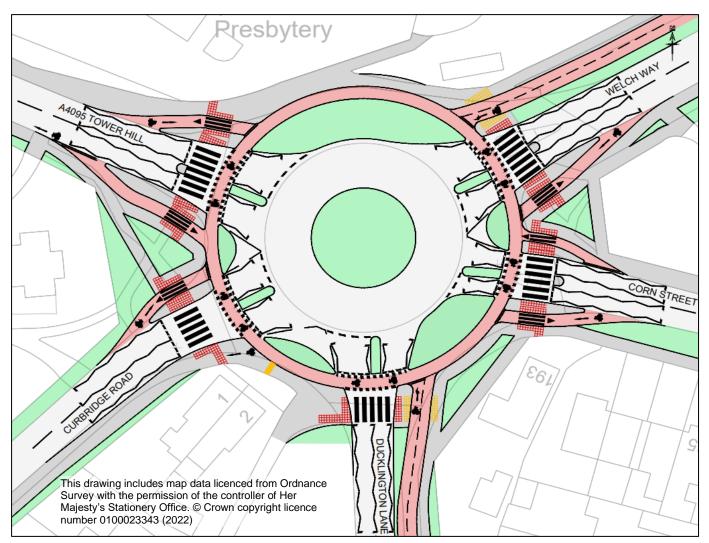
Roundabout with protected space for cycling at Fiveways Roundabout
